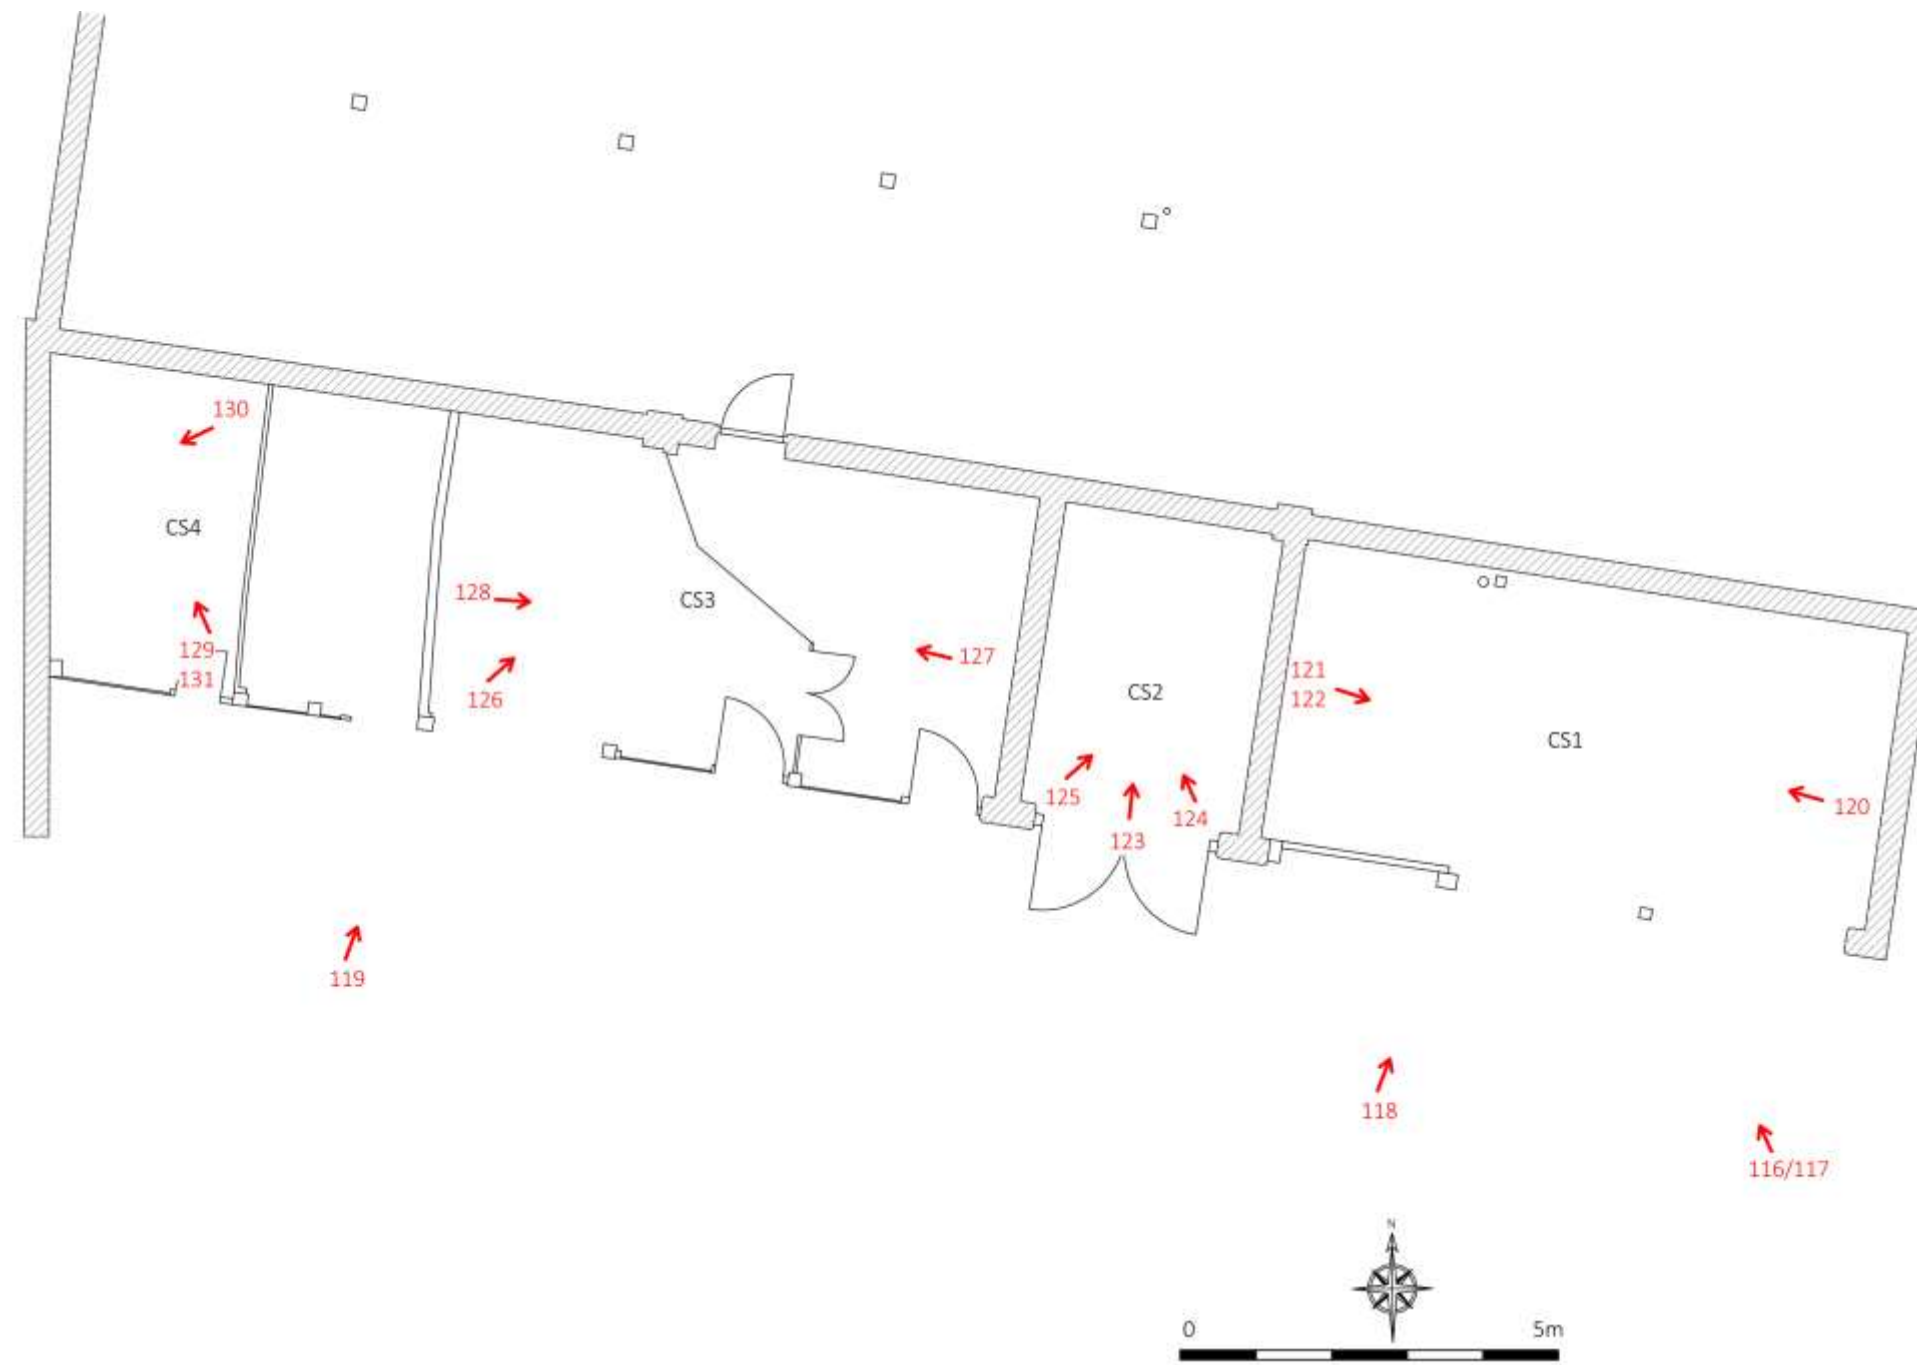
Cattle shed floor plan showing photo views (scale 1:100)
